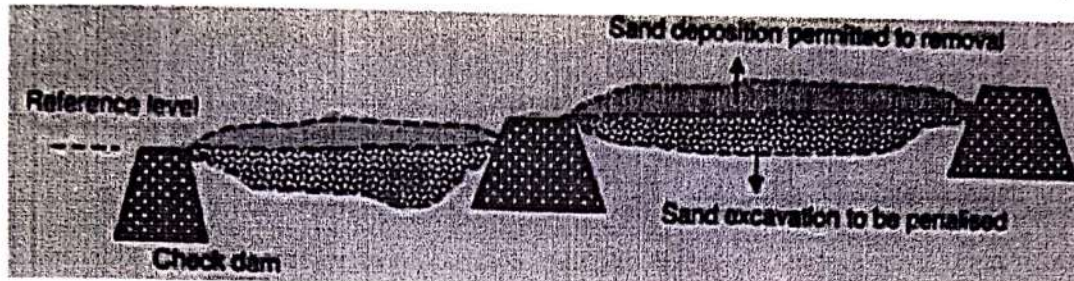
River Cross Section with Check Dams and Bench Mark
